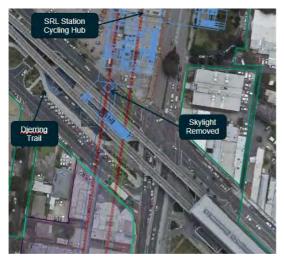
OPTION 1 - REINSTATE CARINISH ROAD IN CURRENT CONFIGURATION LAYOUT
